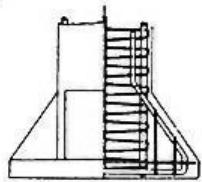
Coignet Beam Reinforcement Consisting of Group of Small Bars
